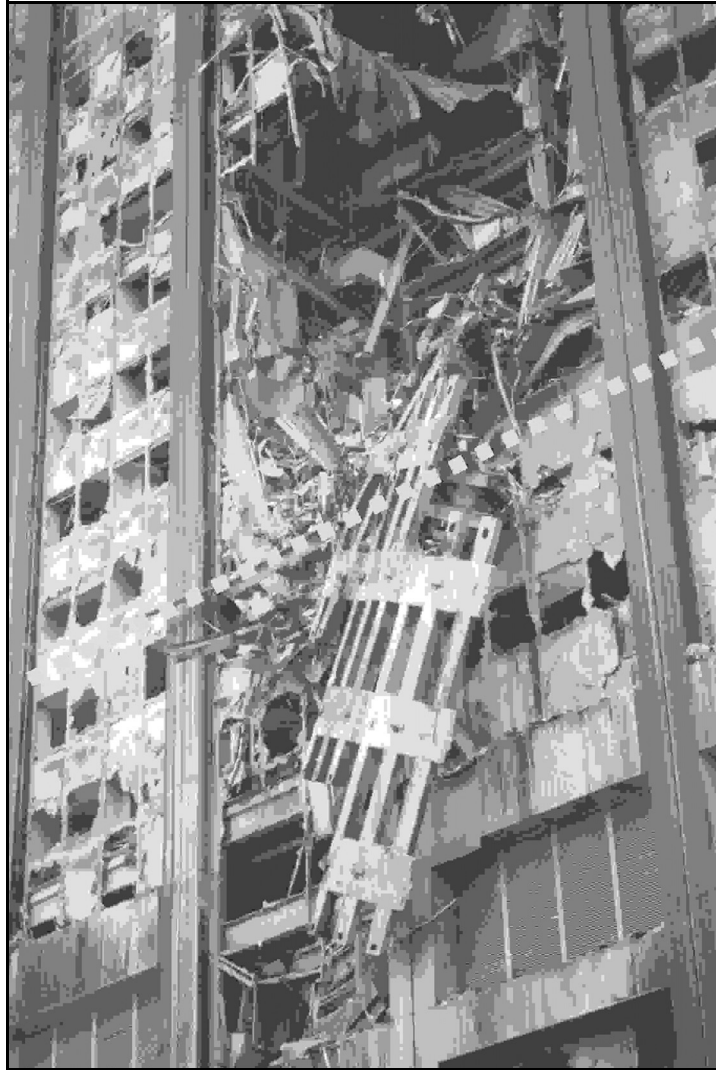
Damage to the northern face of the building between tenant levels 23 and 10—view of damage zone adjacent to level 10.
